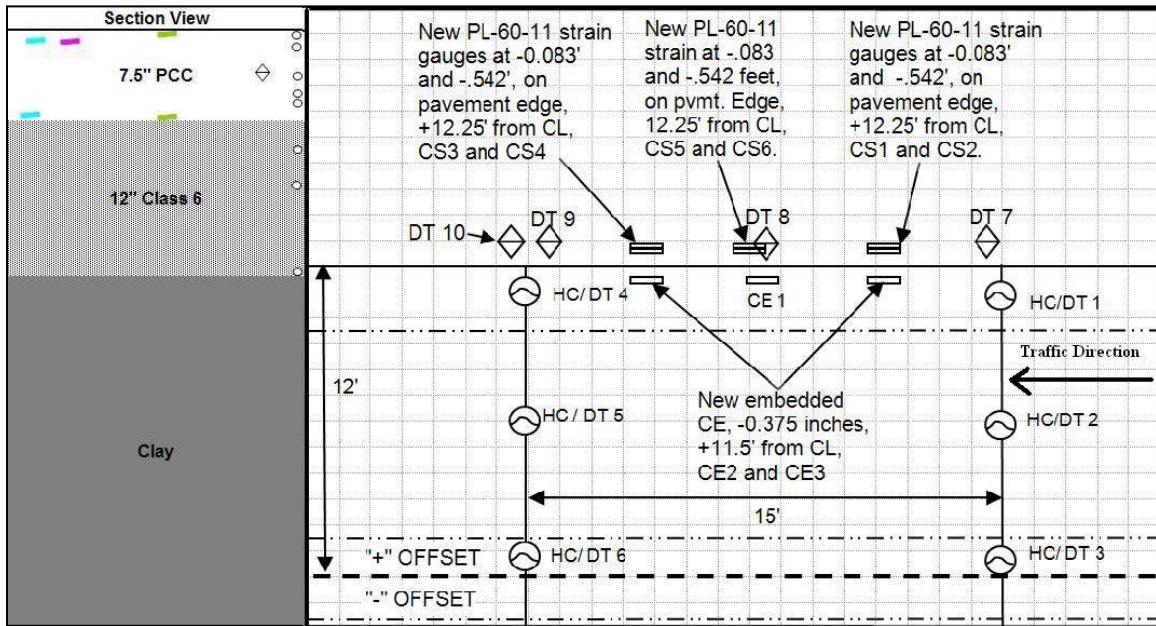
Plan and Profile View for Sensors Instrumented in Cell 54
